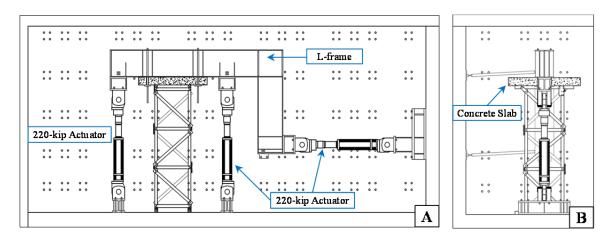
Loading Frame A) Front (Plan) View B) Side View
